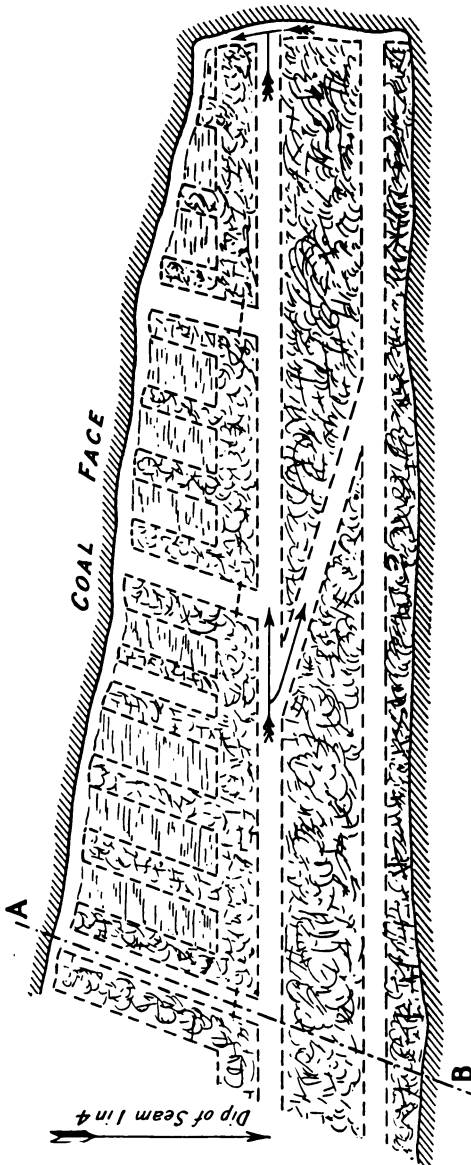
Plan of Long-wall in an Inclined Seam.
